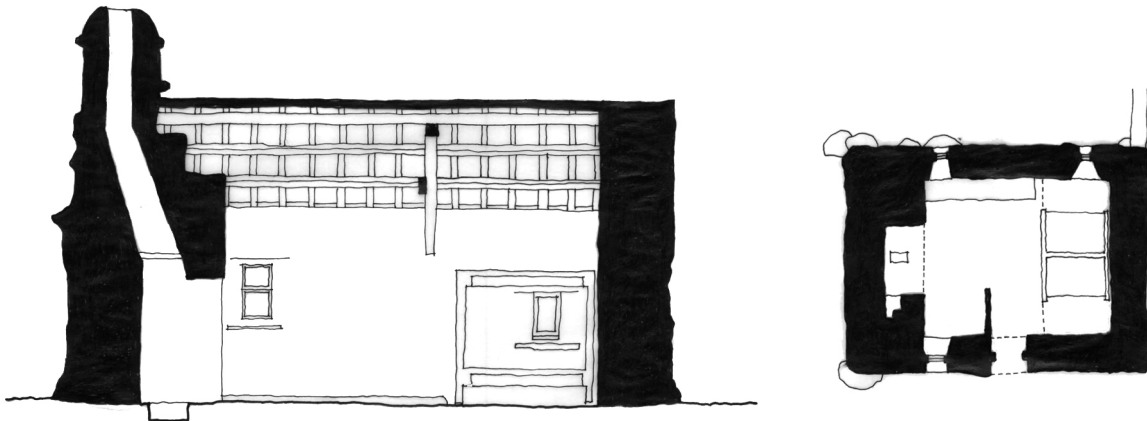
Section of Llainfadyn cottage where many work related tasks and daily errands happened in one room; Fig. 5.4 Plan of Llainfadyn cottage
